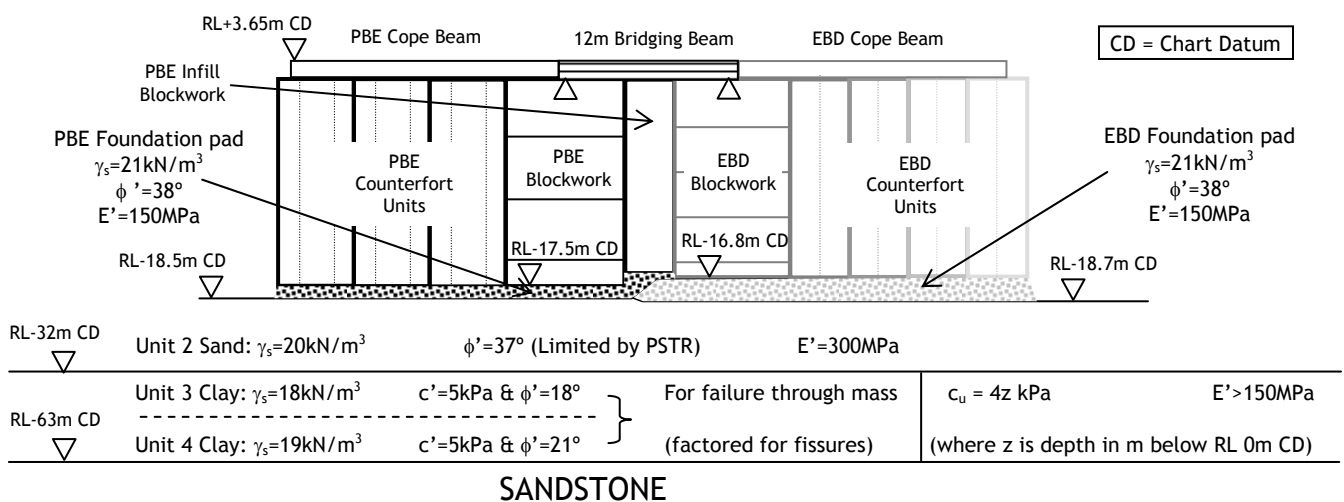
Section A-A': Geotechnical Model and Geotechnical Design Parameters for Transition Structures
